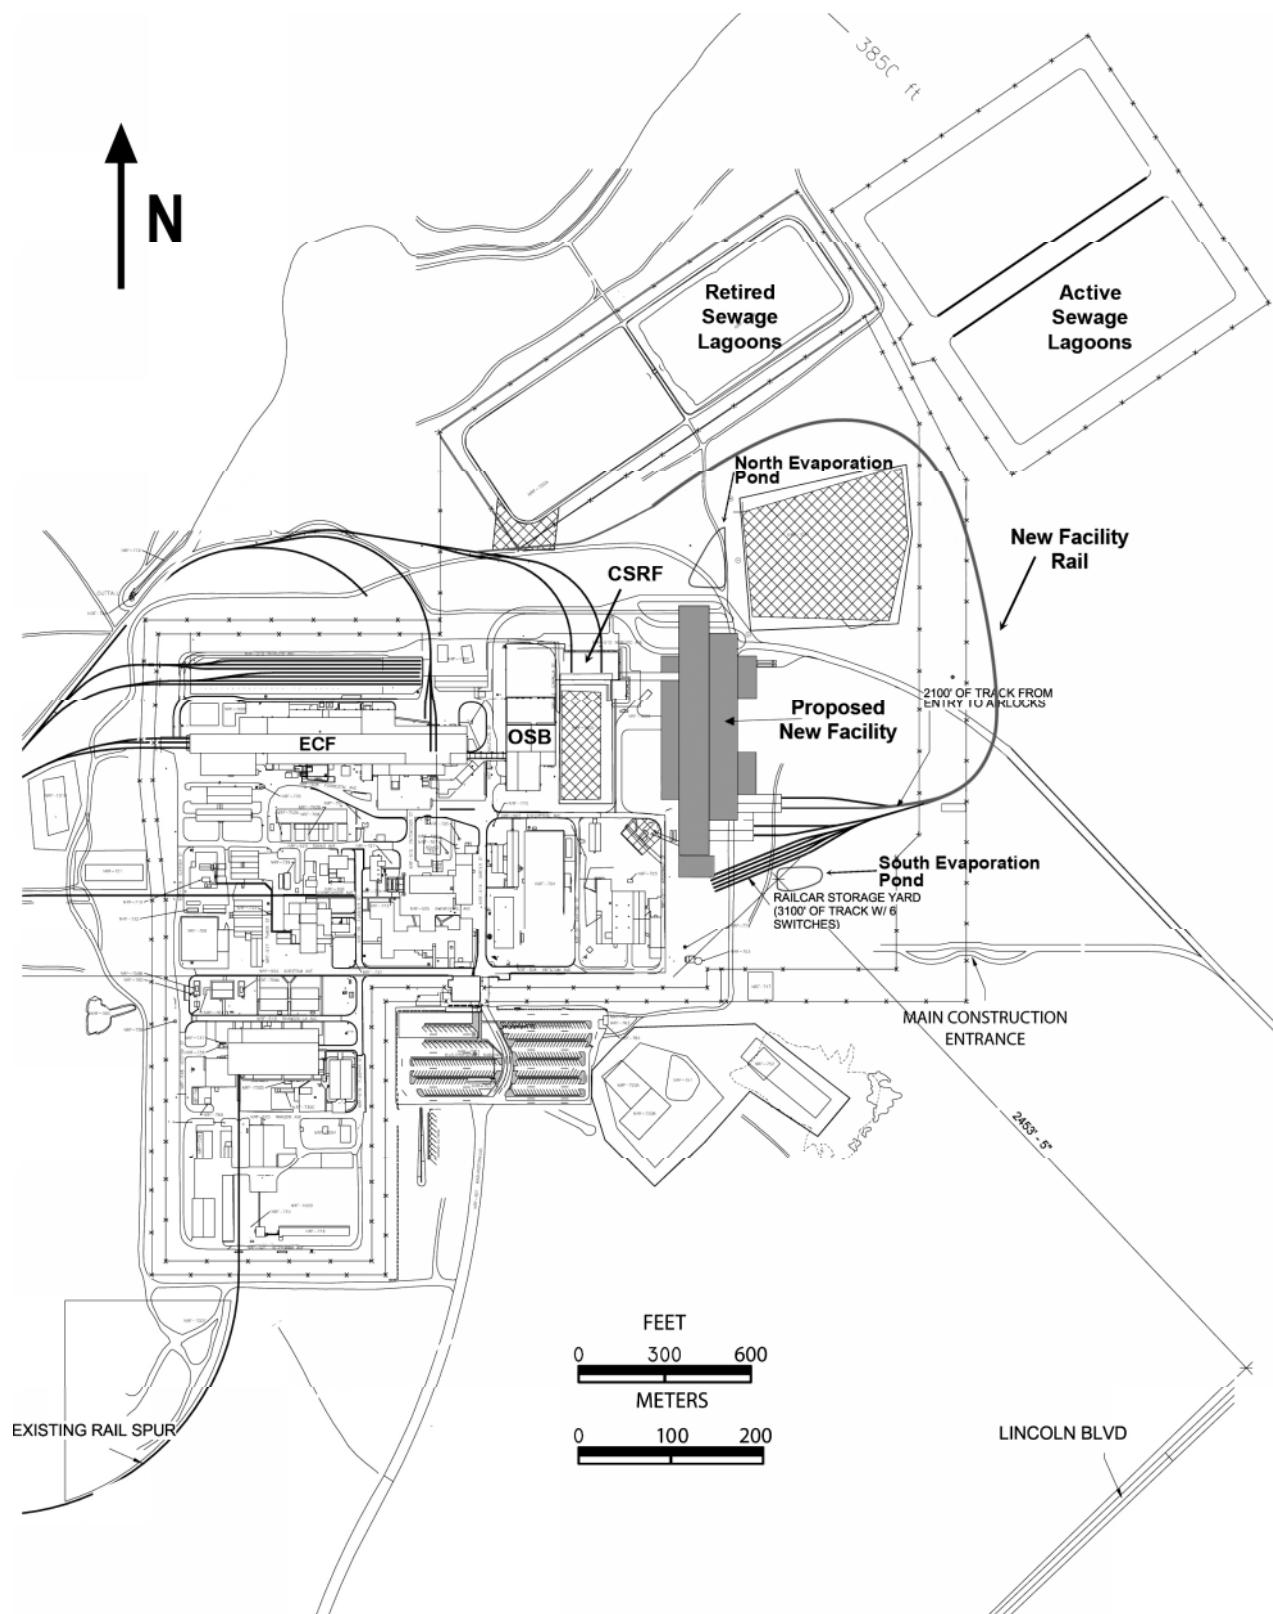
Conceptual New Facility Layout at Location 3/4
